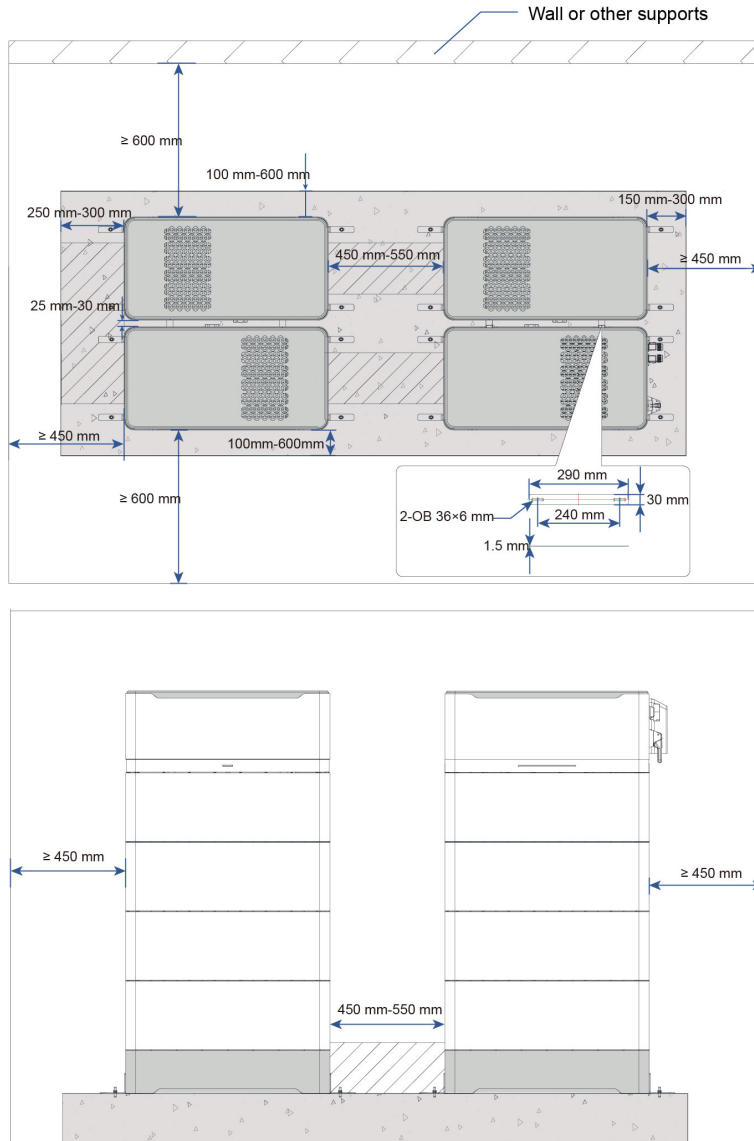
Recommended Installation Clearances for U-Shaped Layout
